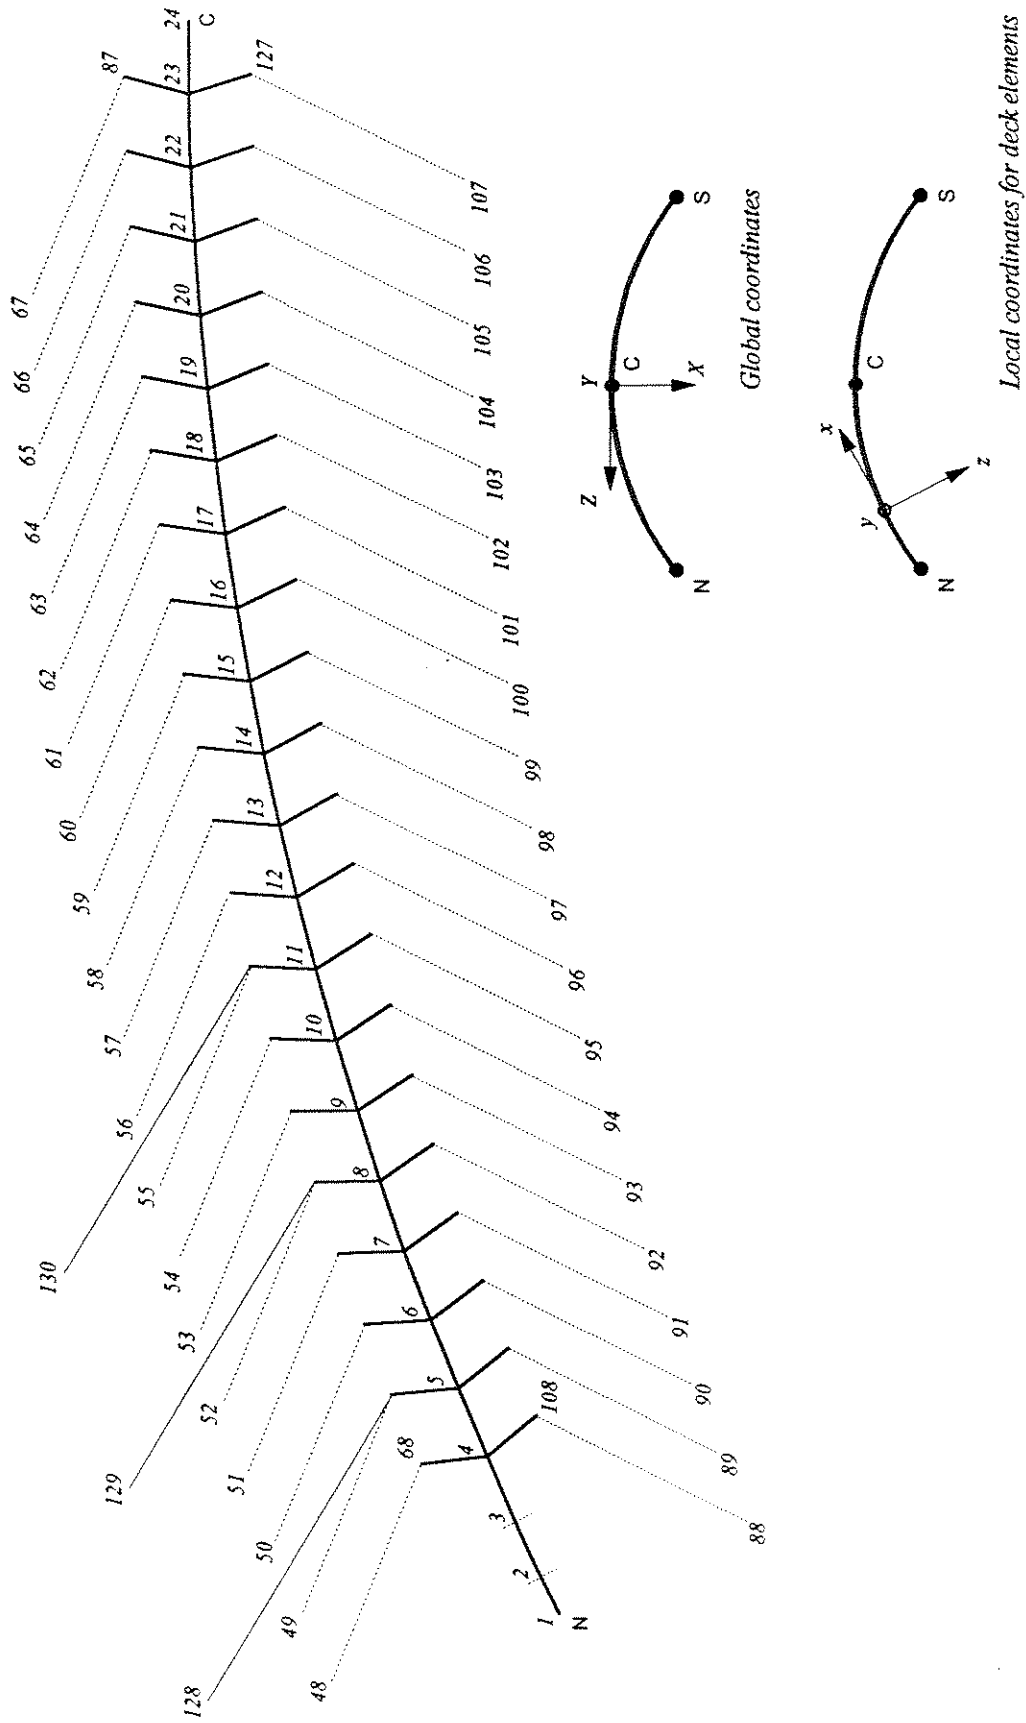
PLAN SHOWING NODE NUMBERS; RUCK-A-CHUCKY CONCRETE BRIDGE
